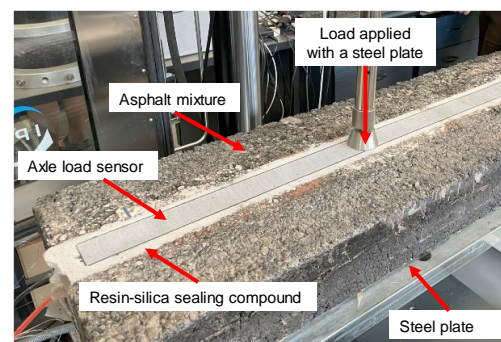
A view on a laboratory stand of axle load sensor – asphalt mixture system under loading in UTM-130 hydraulic press.
